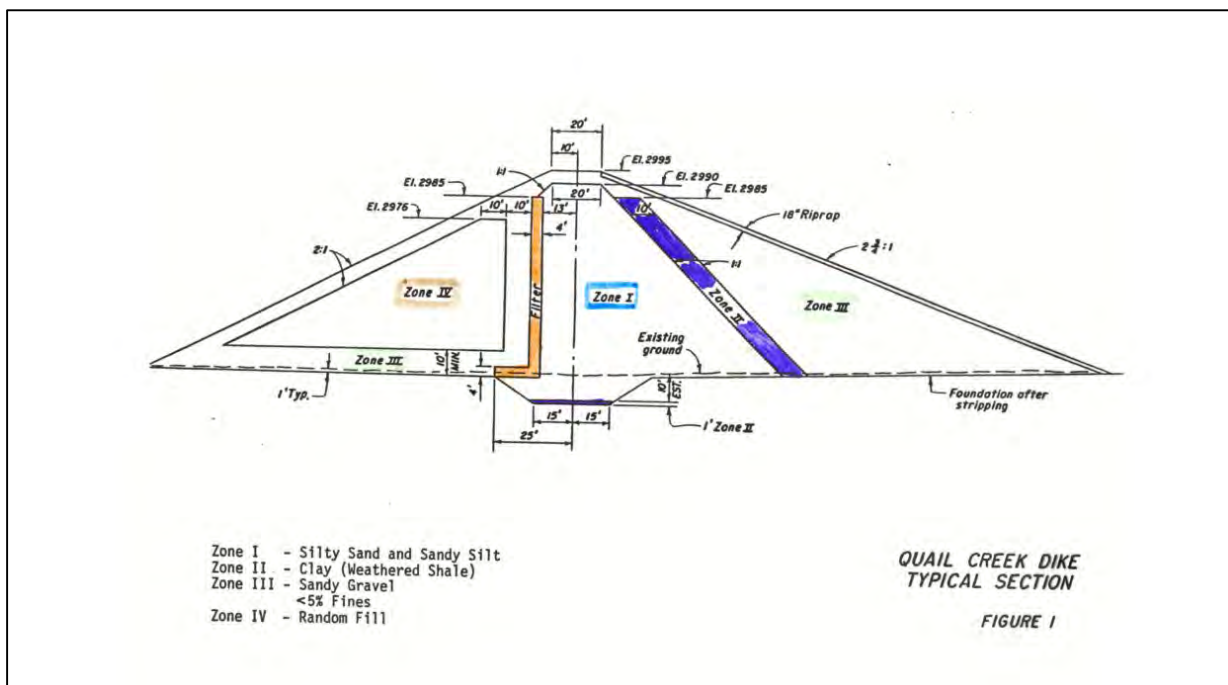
Design cross section through the dike showing zones and cutoff trench.
